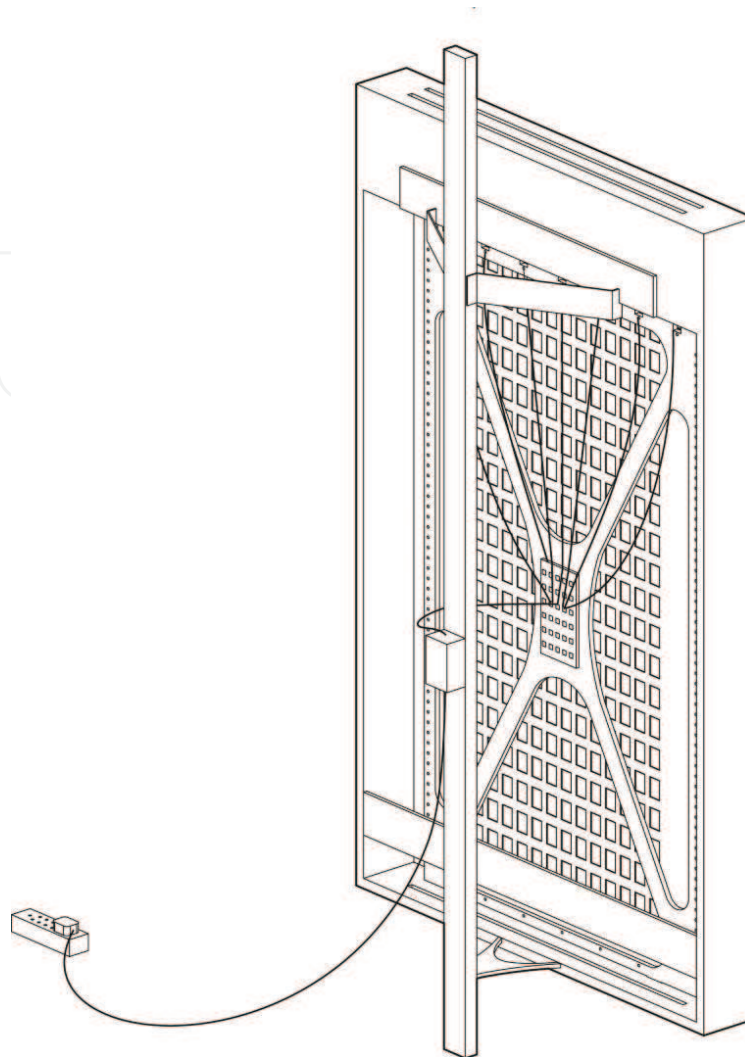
Axonometric showing one Plexiglas box mounted on the supporting rack.
